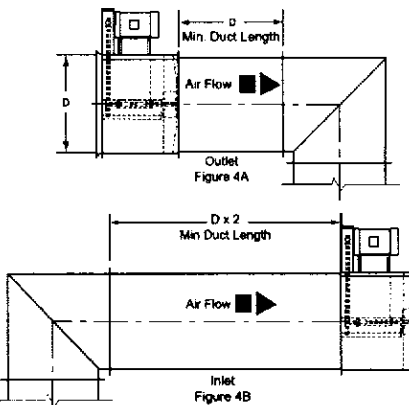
Duct elbows (Inlet and Outlet) Recommendations
